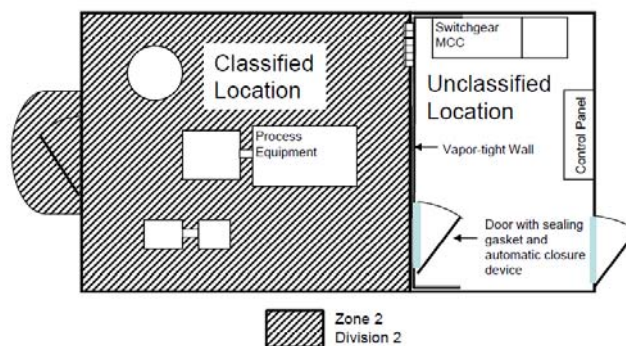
Vaportight Wall Application incorporating a Door between Classified and Non-hazardous Location
